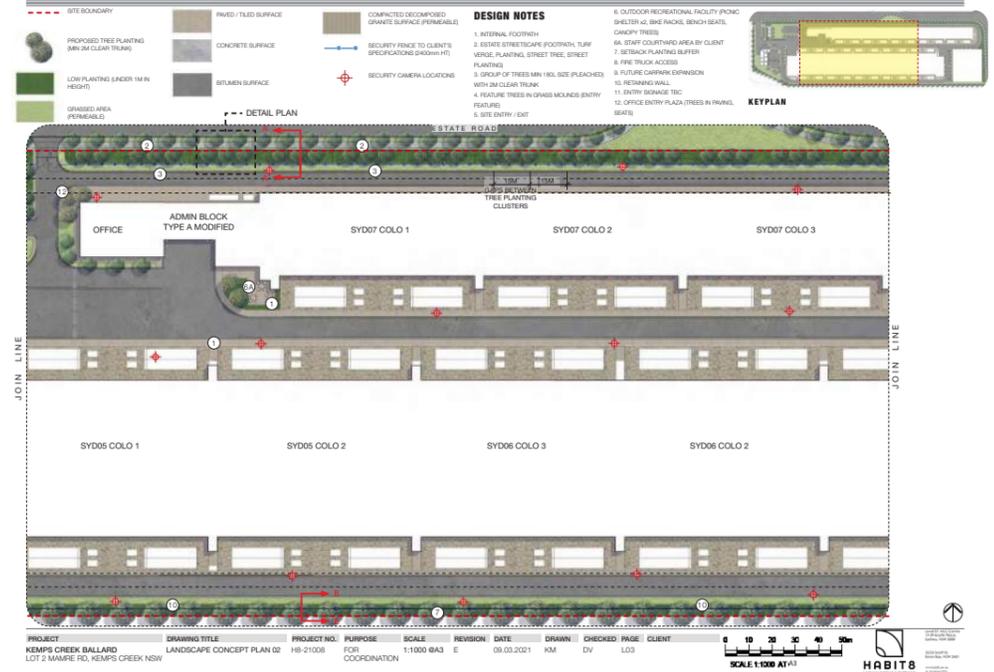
Landscape Concept Plan 02 - (Source: Habit8)
